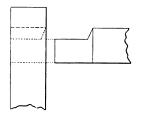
Detail of the Mortise and Tenon Joint Used in the Doors.—Scale, 3 In. to the Foot
